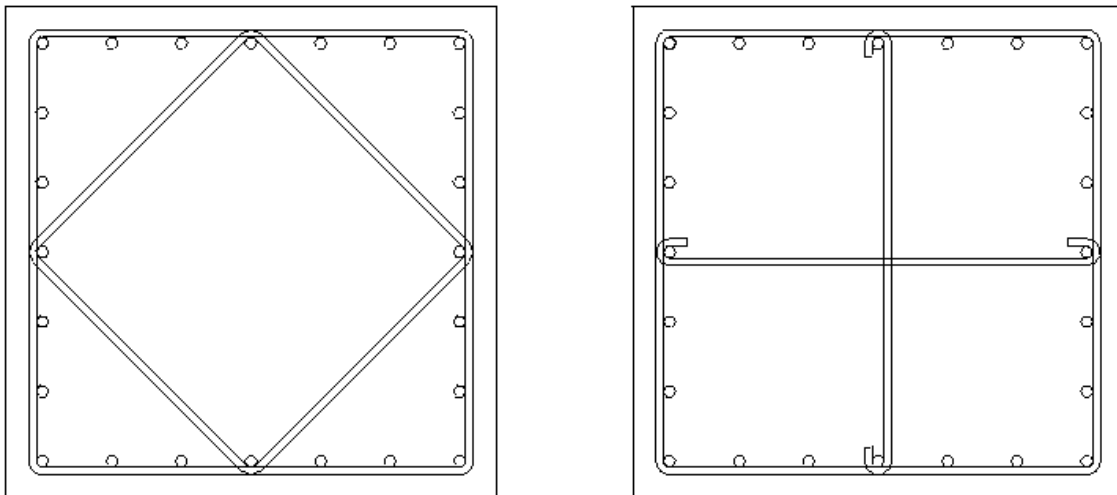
Possible Transverse Reinforcement Arrangements in Solid Rectangular Columns
